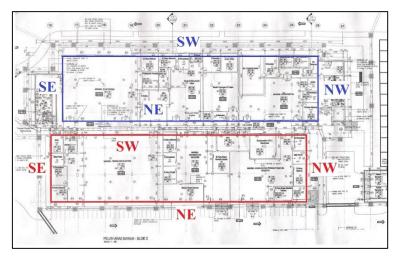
FPTV (Block C) - Floor Plan Drawing (Ground Floor)
